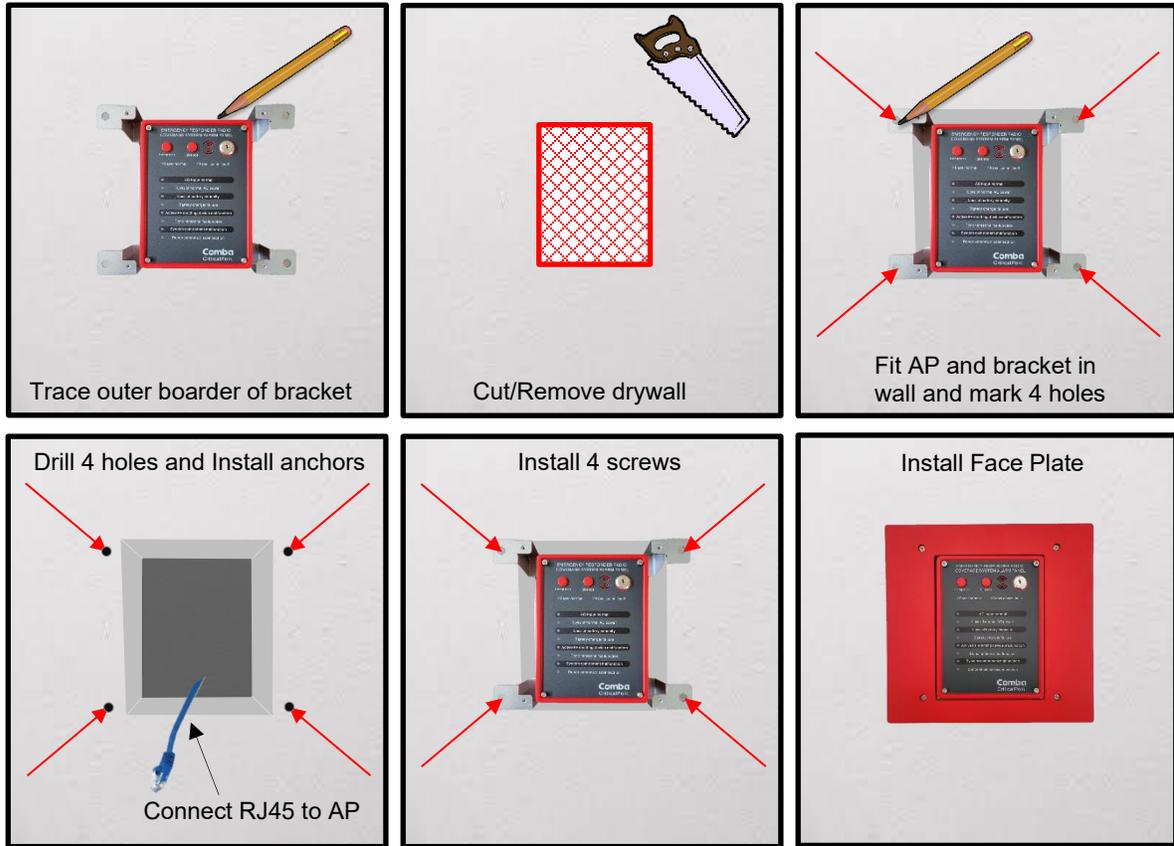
APV3-BDA - Installing Flush Mount Bracket, APV3-BDA, and Face Plate into a Wall
